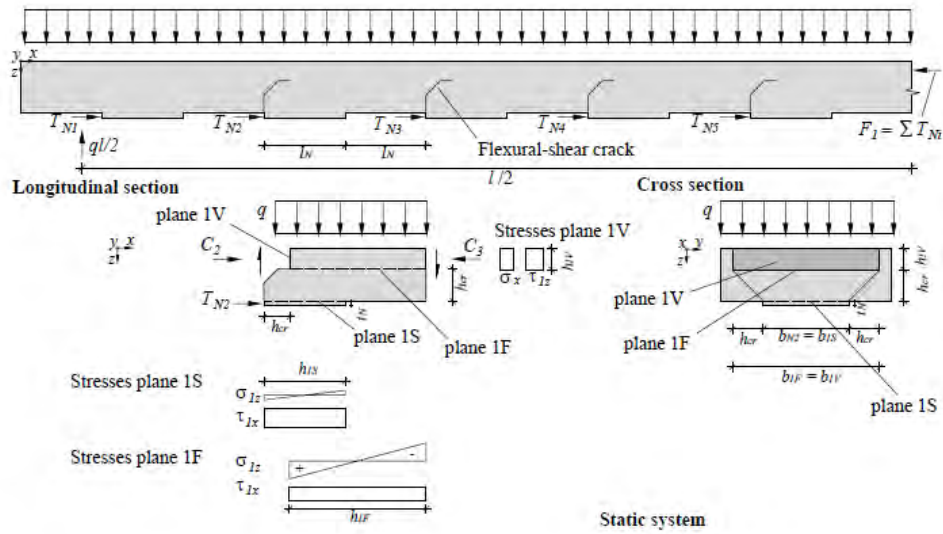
Cantilever model by Boccadoro for the prediction of Concrete Longitudinal Shear Failure (CLSF) at plane 1S, Concrete Diagonal Shear Failure (CDSF) at plane 1F and Concrete Vertical Shear Failure (CSVF) at plane 1V in the notch for traditional TCC floors with a 'thick' cracked concrete slab [4].
